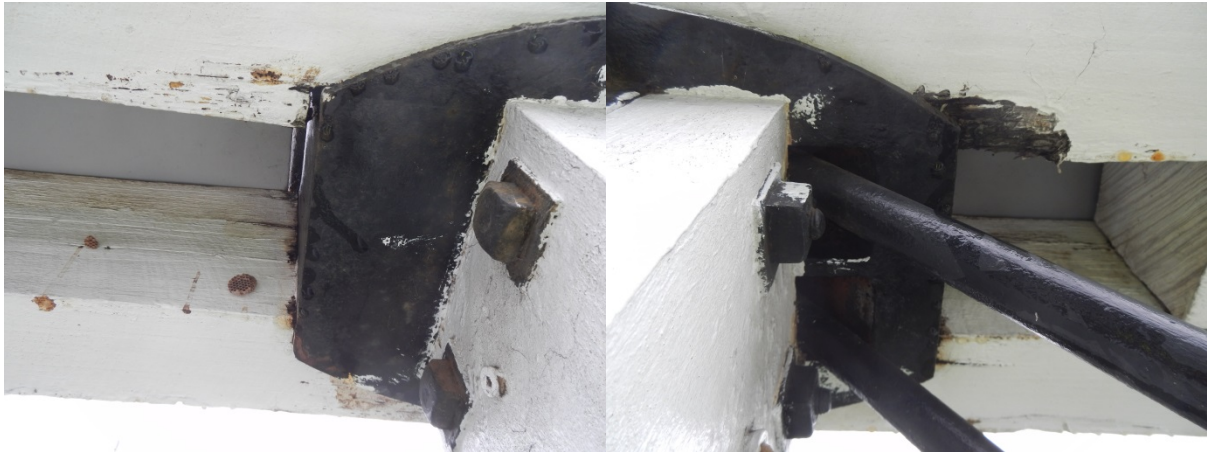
Photographs of failed top chord at anchor block location (source: Author, March 2017)
